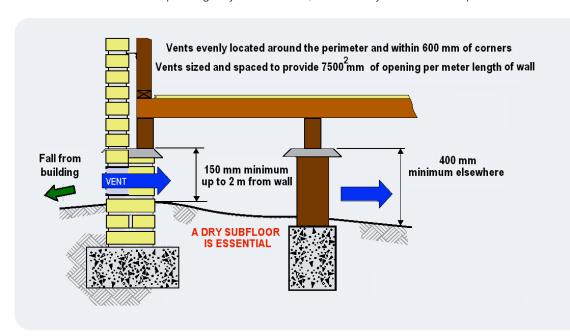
Cross ventilation must be provided to sub-floor areas.
